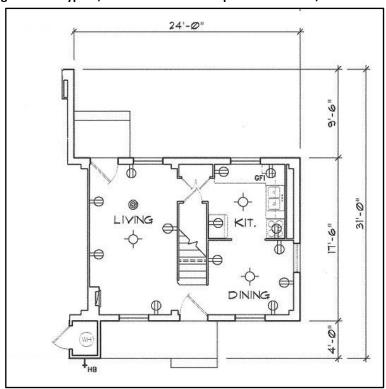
Type A, Three-Bedroom Floorplan - First Floor, Corner Unit
